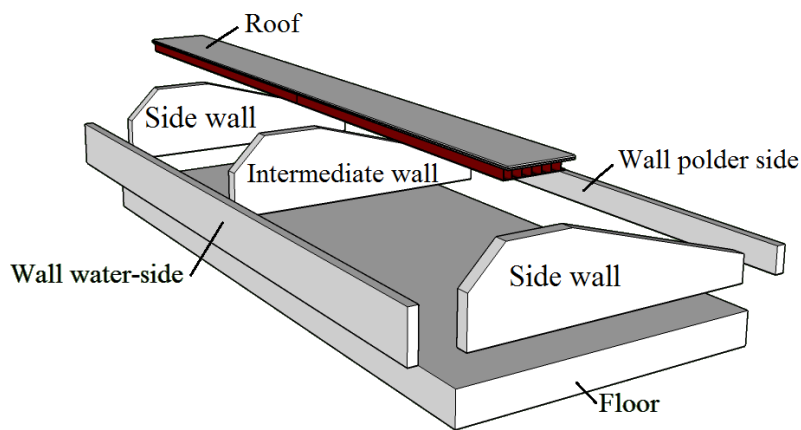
Overview of structural elements, excluding the water retaining glass elements
